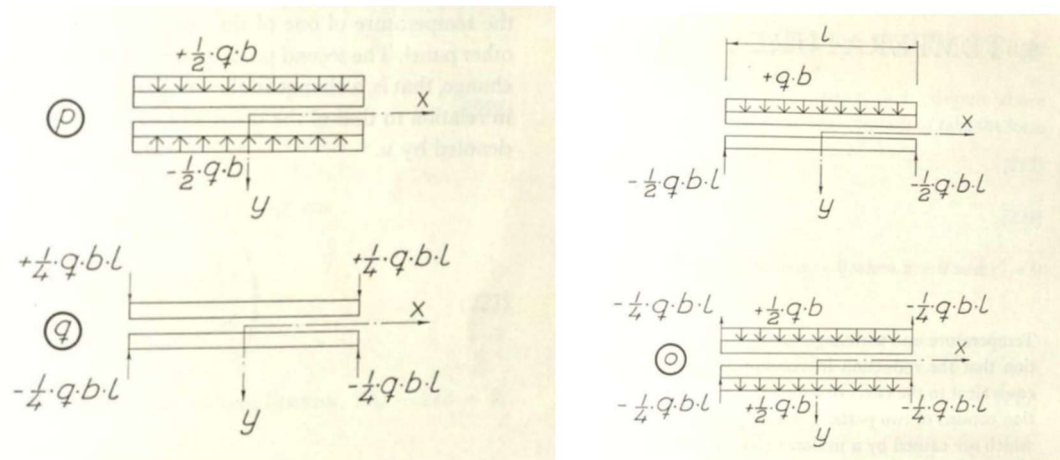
Sandwich Wall Panel under Uniform Transverse Loading (Holmberg and Plem, 1965)
